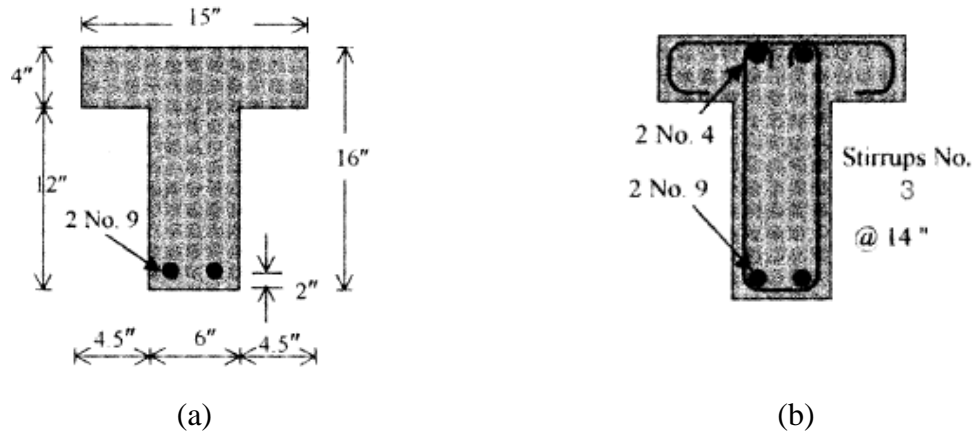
Cross sectional details of the tested beams (a) Beam without stirrups (b) Beams with stirrups, Lorenzis & Nanni (2001)
